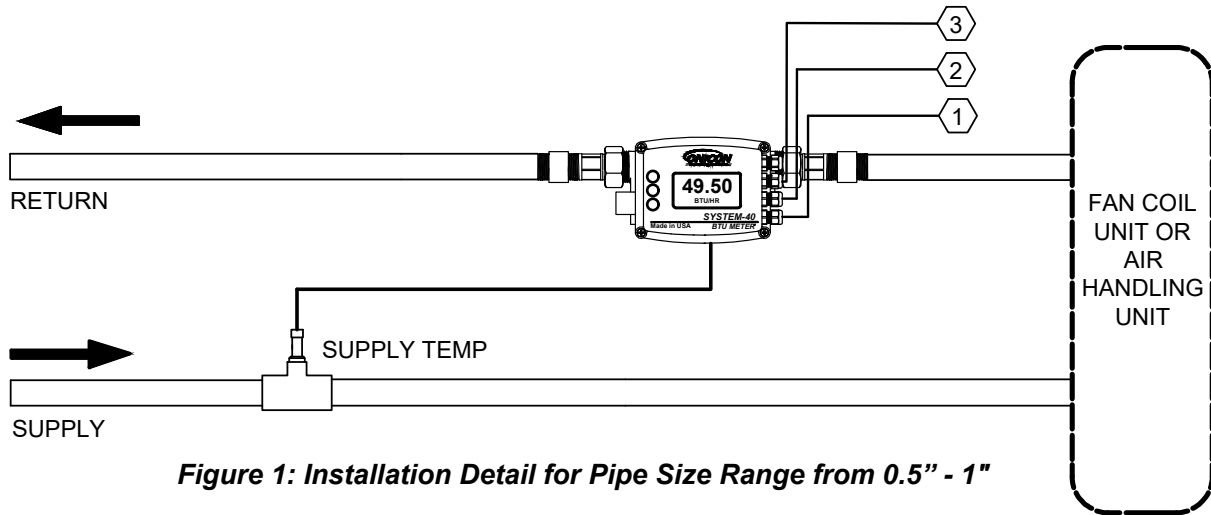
Installation Detail for Pipe Size Range from 0.5" - 1"
